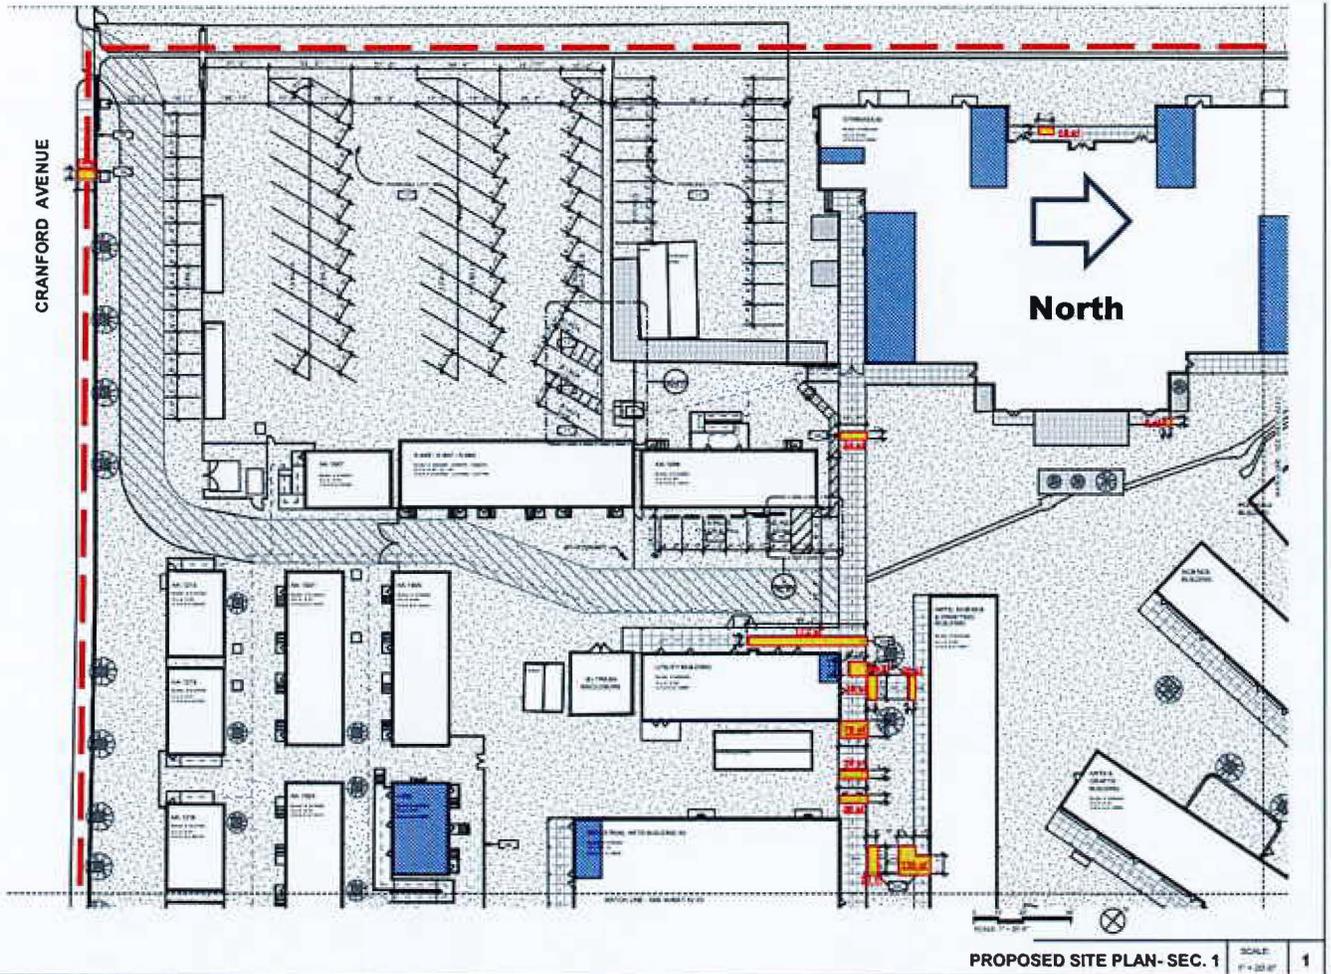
Proposed Site Plan: Cranford Avenue (South Side of Campus)
